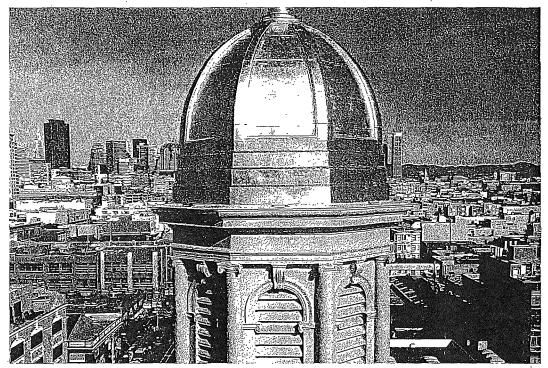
Gilded sheet metal dome and top of sheet metal cupola. (Palisade Builders, 05/20/2018)
